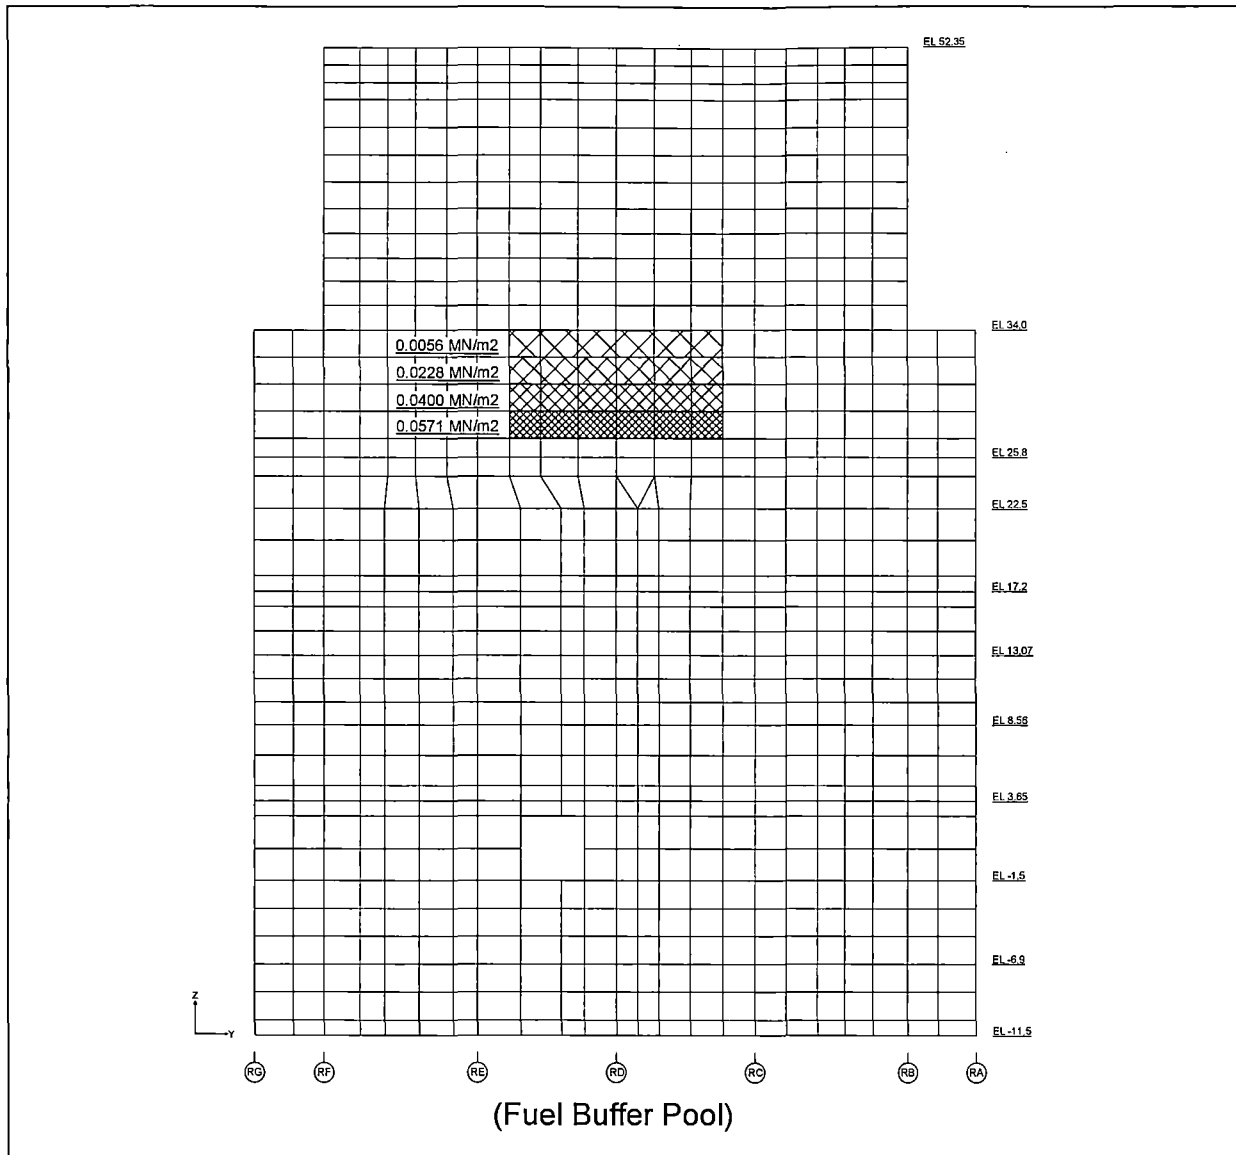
Hydrostatic Loads on the R7/F1 External Wall
